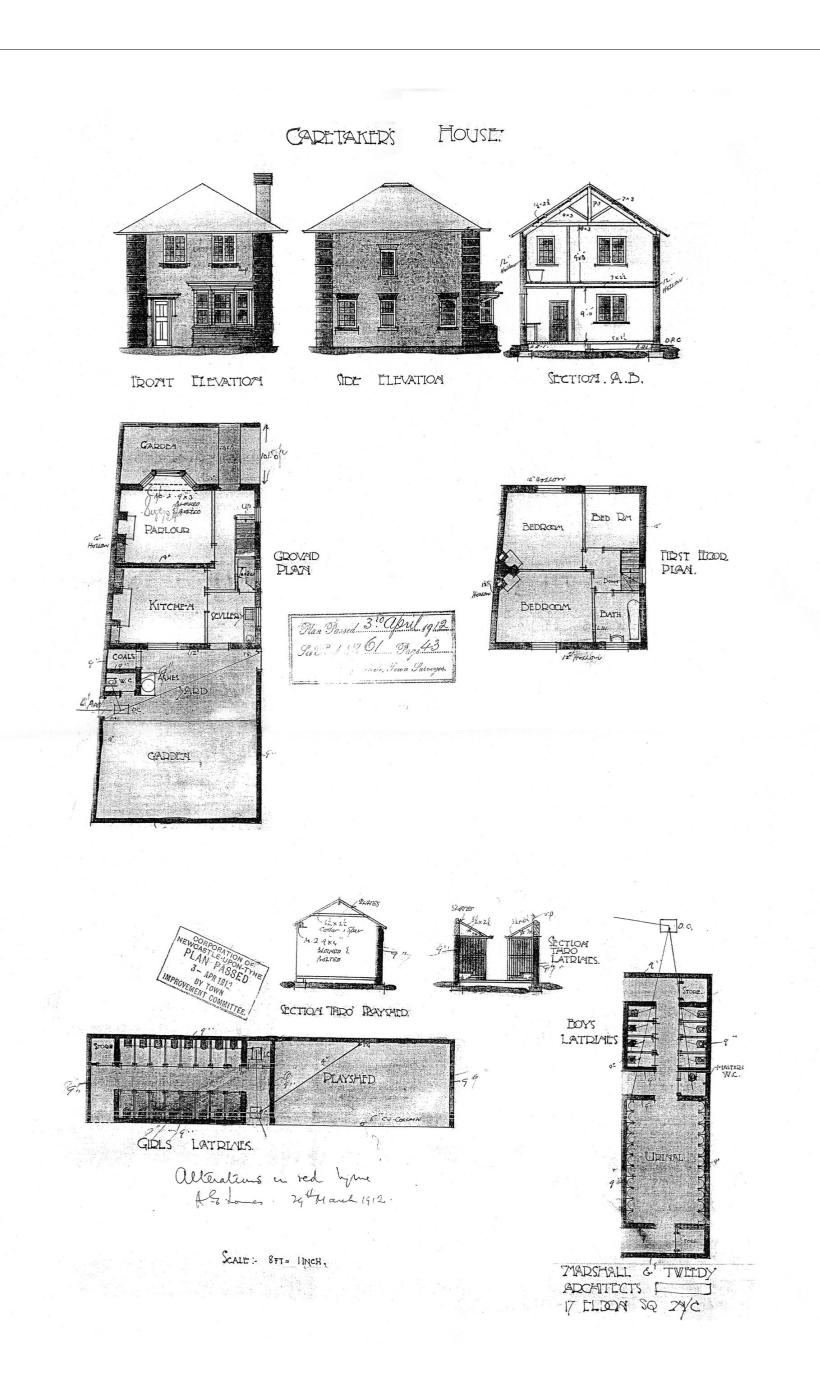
Plans and Sections. Caretaker's House, Latrine Blocks and Playshed. Proposed Schools, Walker Gate, Newcastle-upon-Tyne
